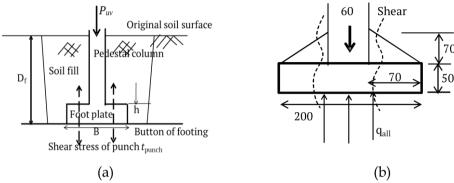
A practical design of foundation in this study: (a) Designed in the contractual, (b) Modified footing structure
